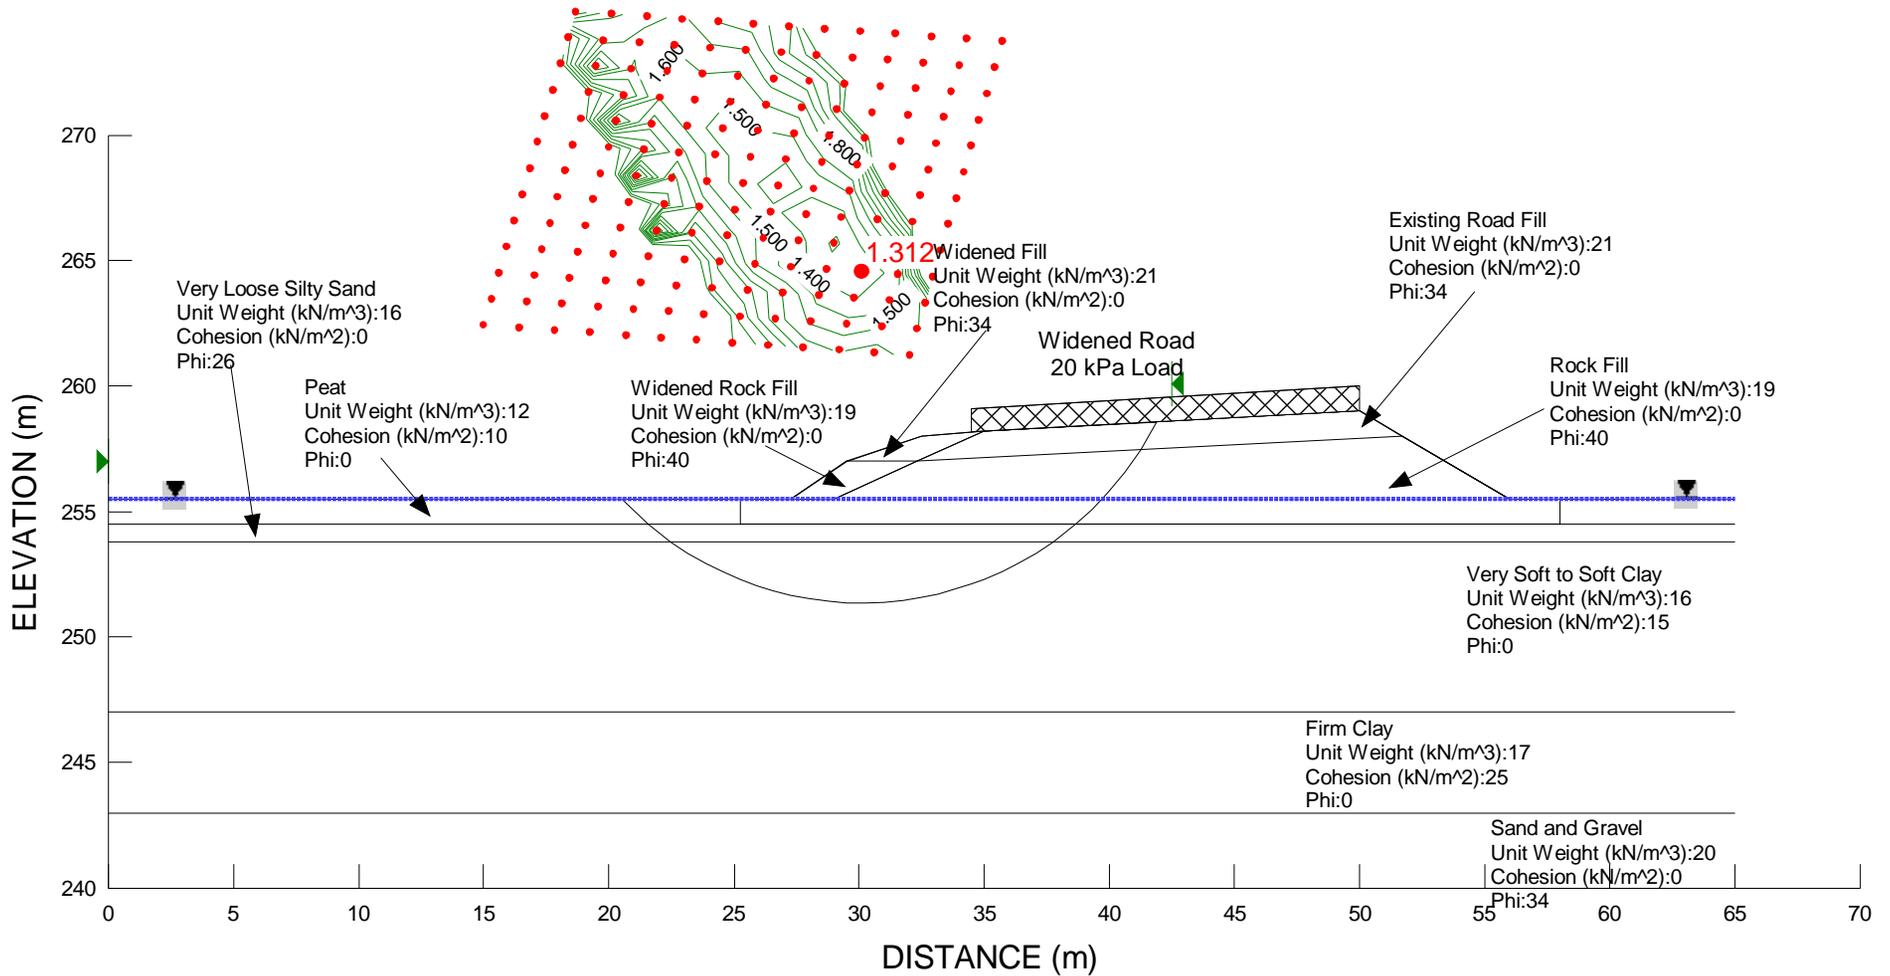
Slope Stability Analysis of Section at Station 19+100 with 2.5 m Road Widening (End of Construction - Slip Surface within Westbound Lane)
